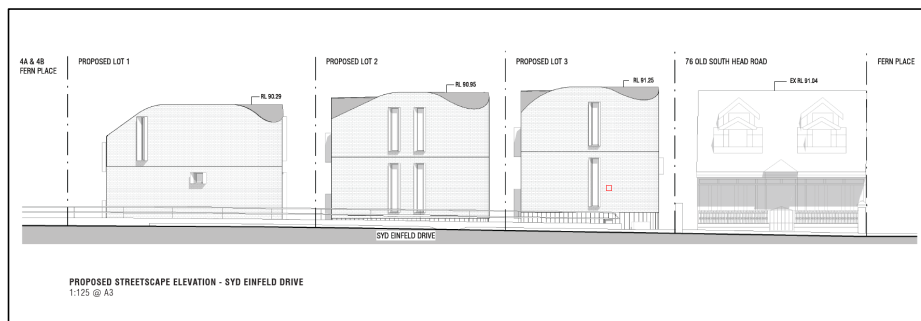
Streetscape Elevation Syd Einfeld Drive (Source: Modscape Architects)
